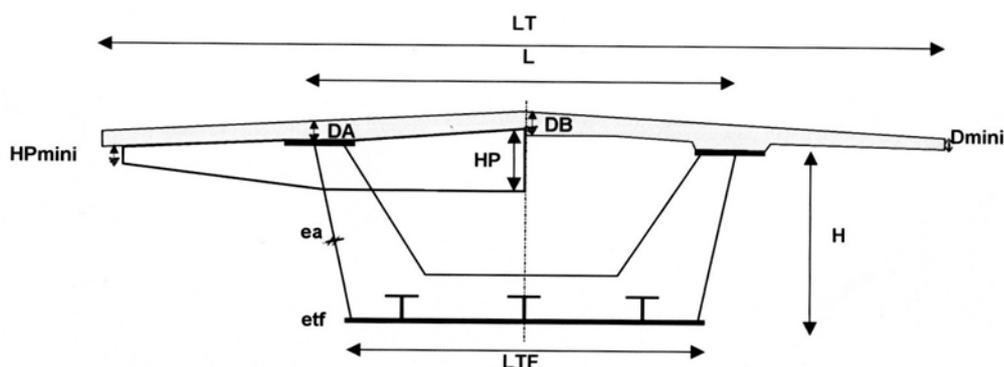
Design parameters for a box girder composite bridge (with directly supporting cross-beam and cantilevers at left, no cantilevers at right)
